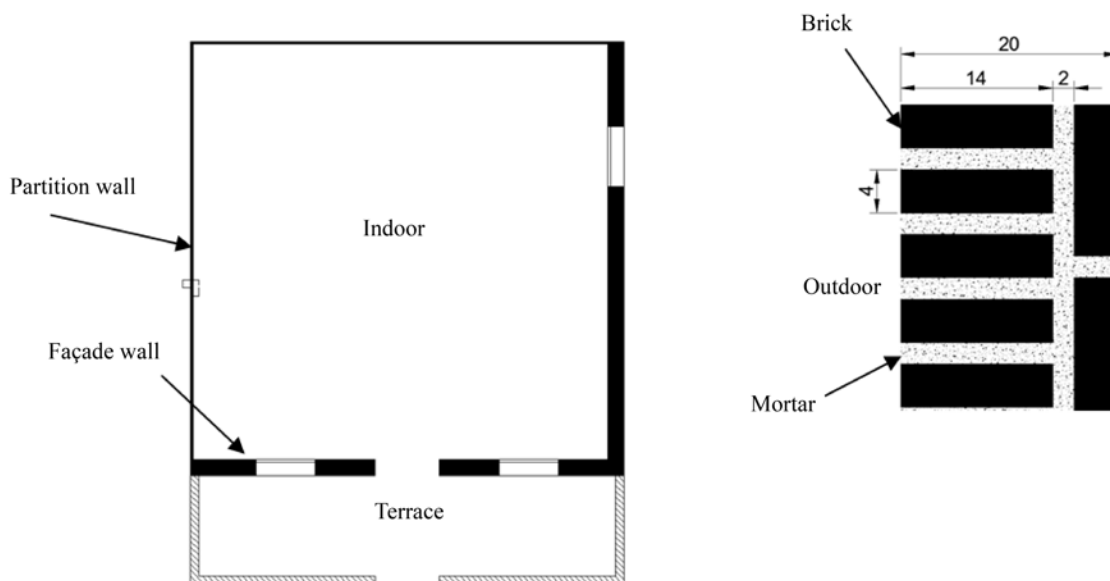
Plan of the dwellings and section (in cm) of the façade.
